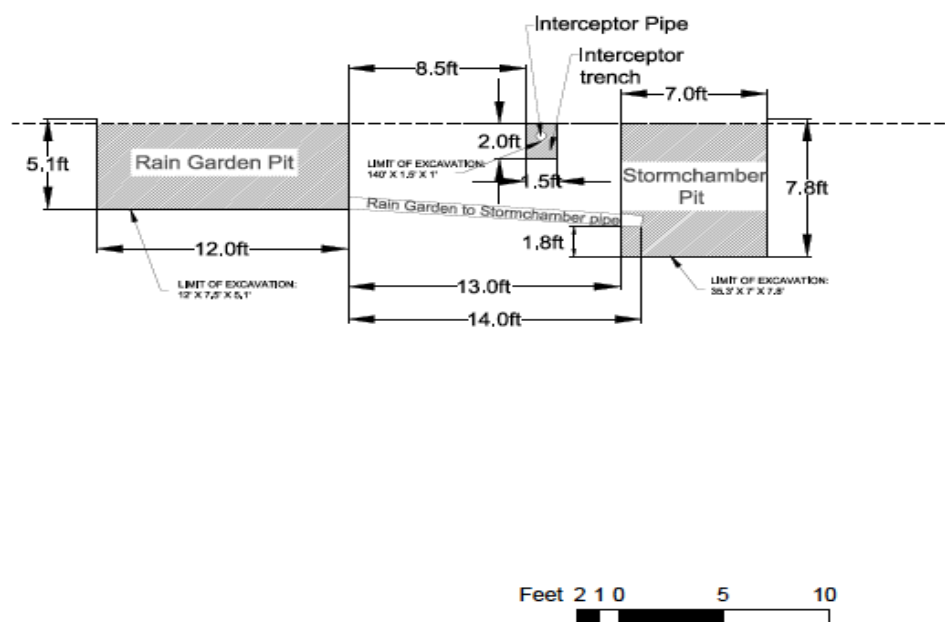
Pipe connection layout between the rain garden (bioretention facility) and the storage facility (StormChamber[®])
